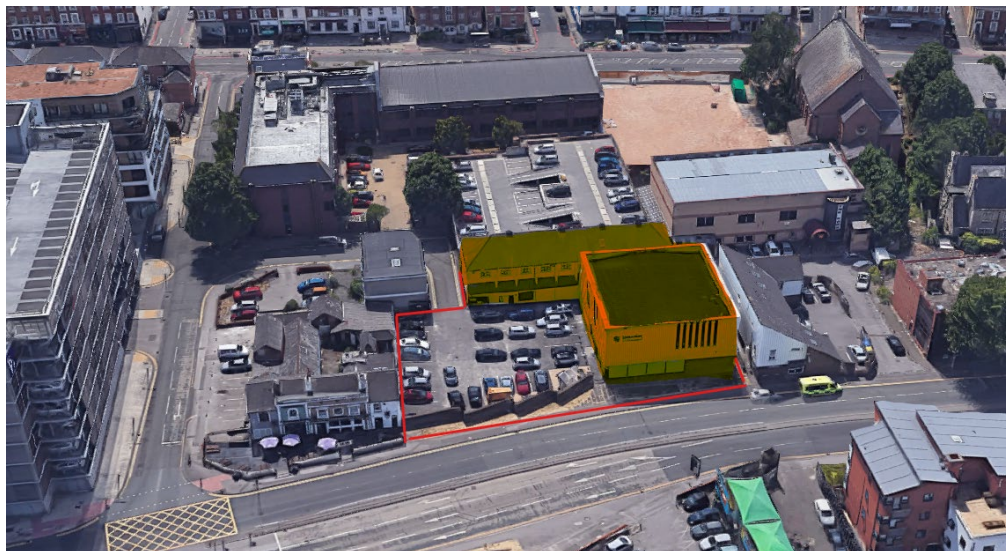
Aerial image looking south showing application site and buildings to be removed (Google maps 2021)
